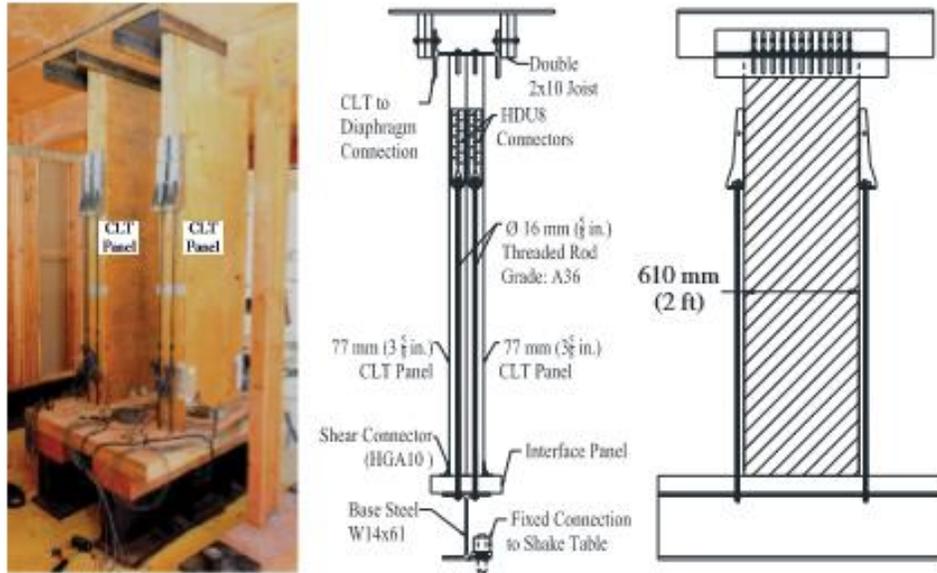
4: CLT retrofit for the first soft story with elevation and cross section (Bahmani et al., 2014)
